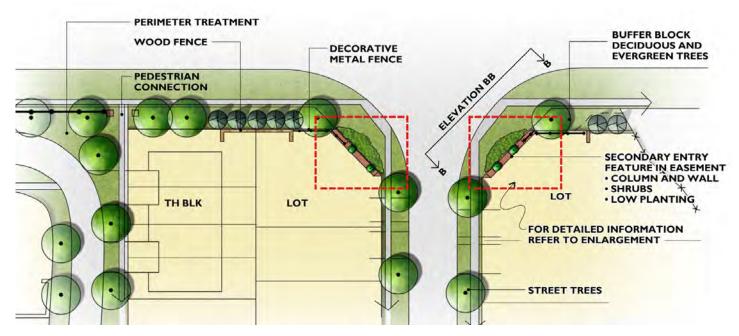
Secondary Gateway Layout, Example at Mayfield Road and North South Local Road.
